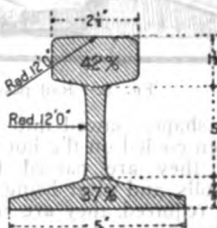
Flanged T section rail—80 lbs. per linear yard. Standard Am. Soc. Civil Engineers.
